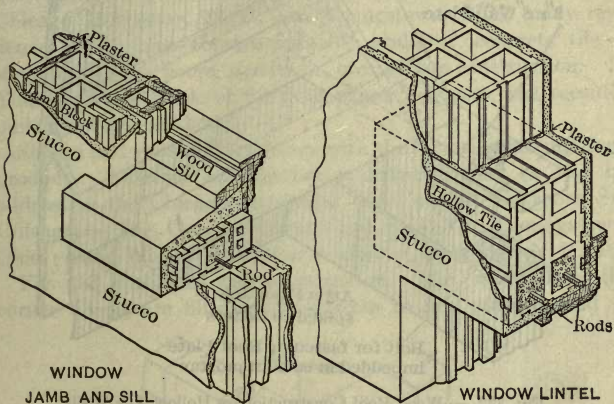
Hollow Tile Window Jamb, Lintel and Sill Construction.
